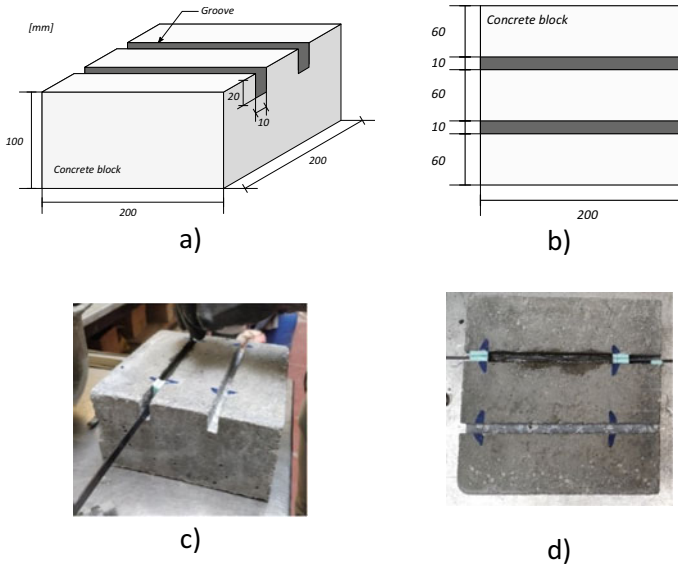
Schematic representation of the specimen in a perspective and b plan view; c placement of CFRP laminate inside the groove, and d Strengthened prism (all dimensions are in mm)
